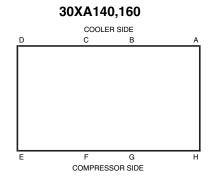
B — Unit Mounting Weights (Units with Al/Cu Condenser Coils) (cont)
